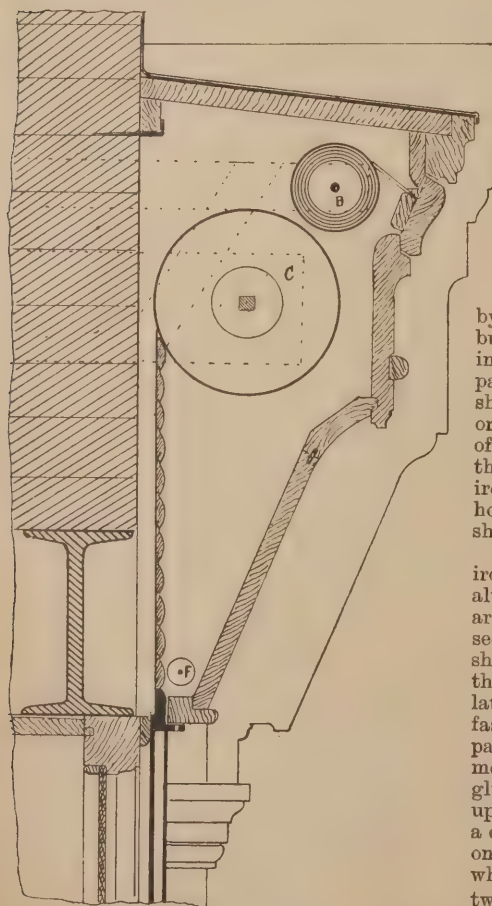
SECTION OF A SPRING ROLLER SHUTTER FOR SHOPS.
